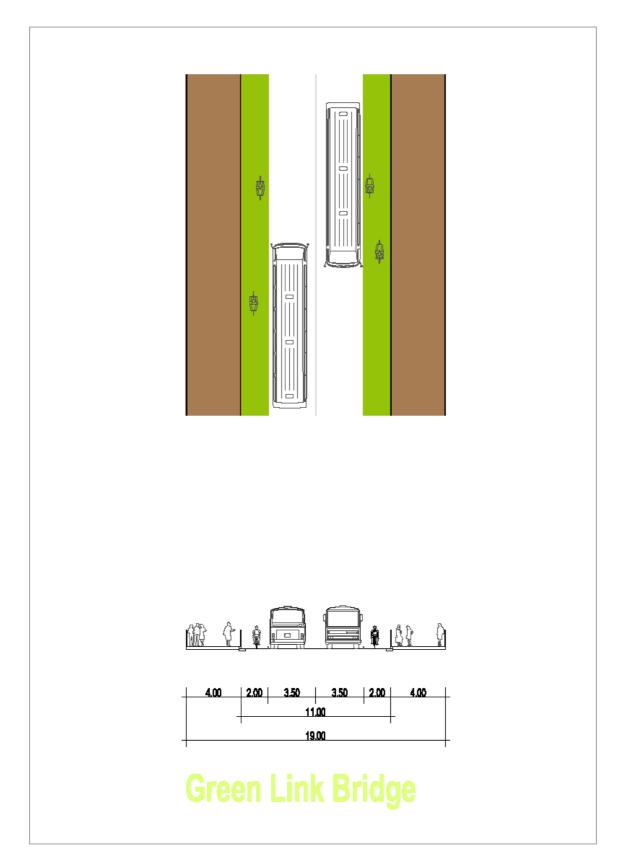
(a) Greenlink Corridor (Dedicated Alignment) - Typical Cross Section
